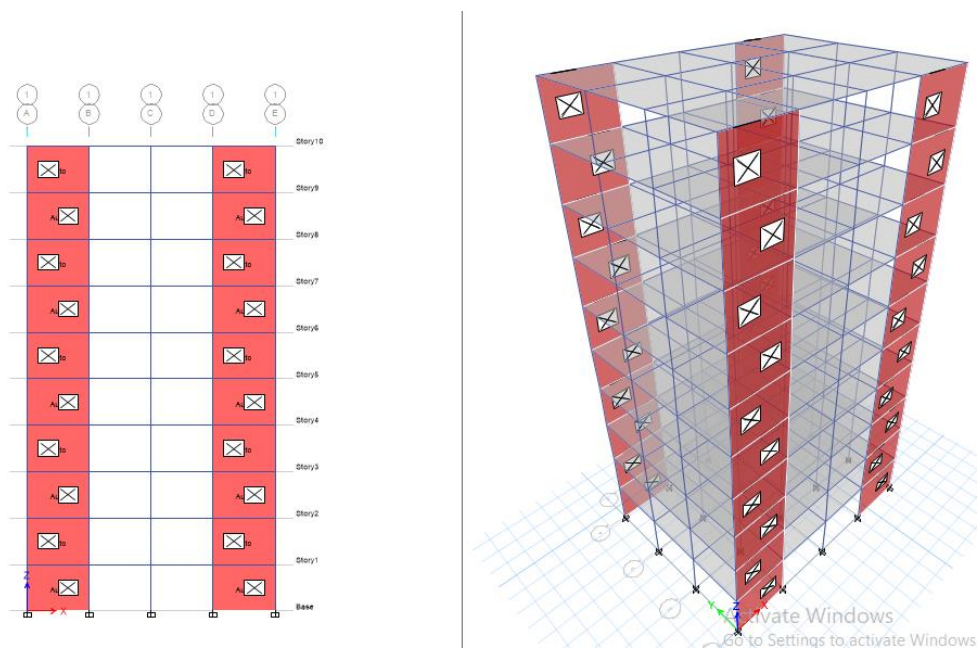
Geometric model of the 10-story building with zigzag openings.
